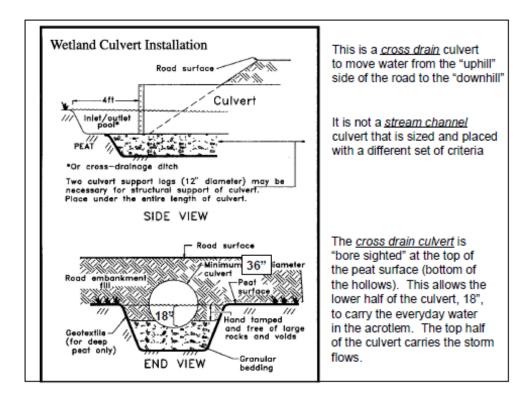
A 36-inch Diameter Cross Drain Culvert Used for Road Constructed in Wetland Area.
